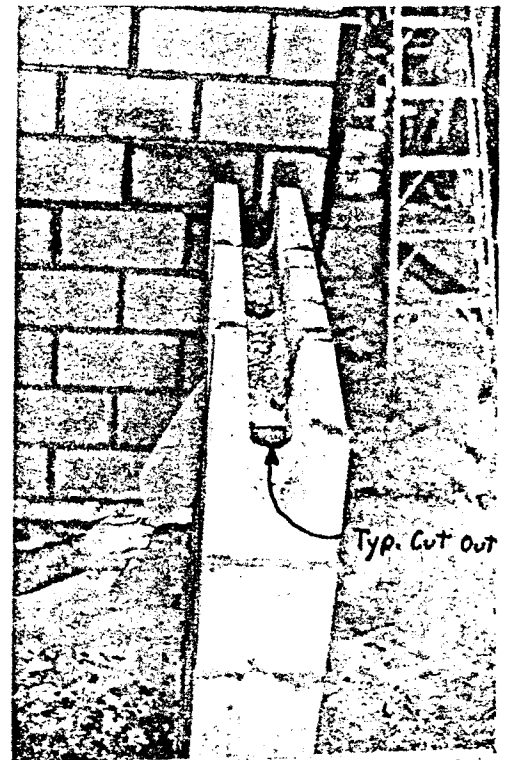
Illustrates typical bond beam cut outs to permit grouting of vertical cores.
